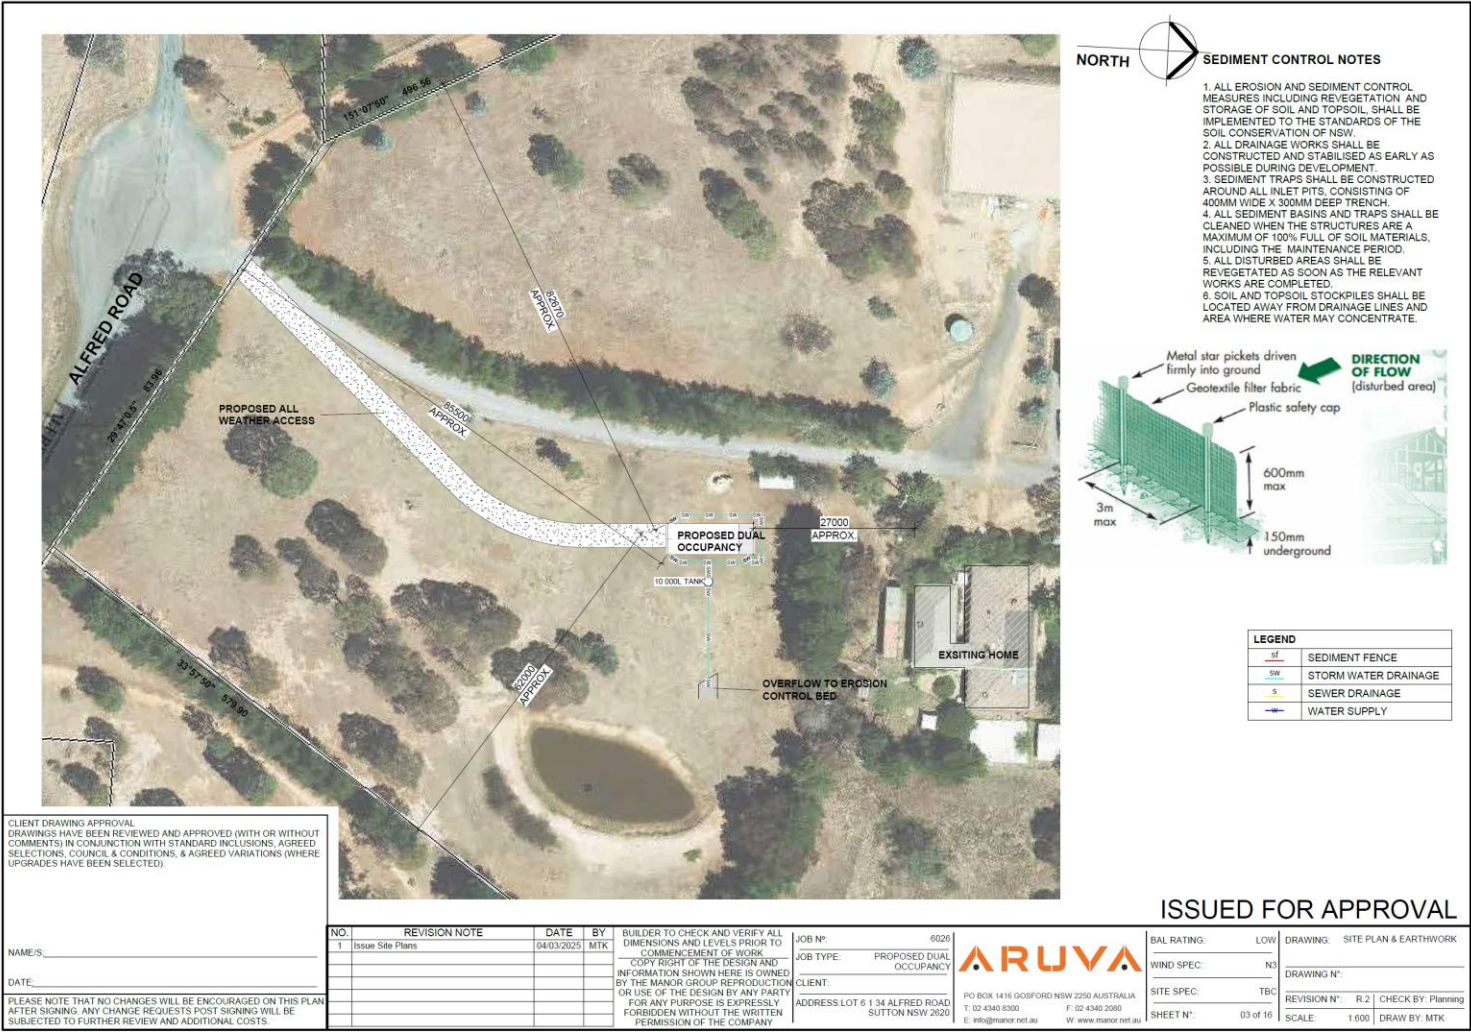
Site plan showing location of proposed Dual Occupancy and existing dwelling
